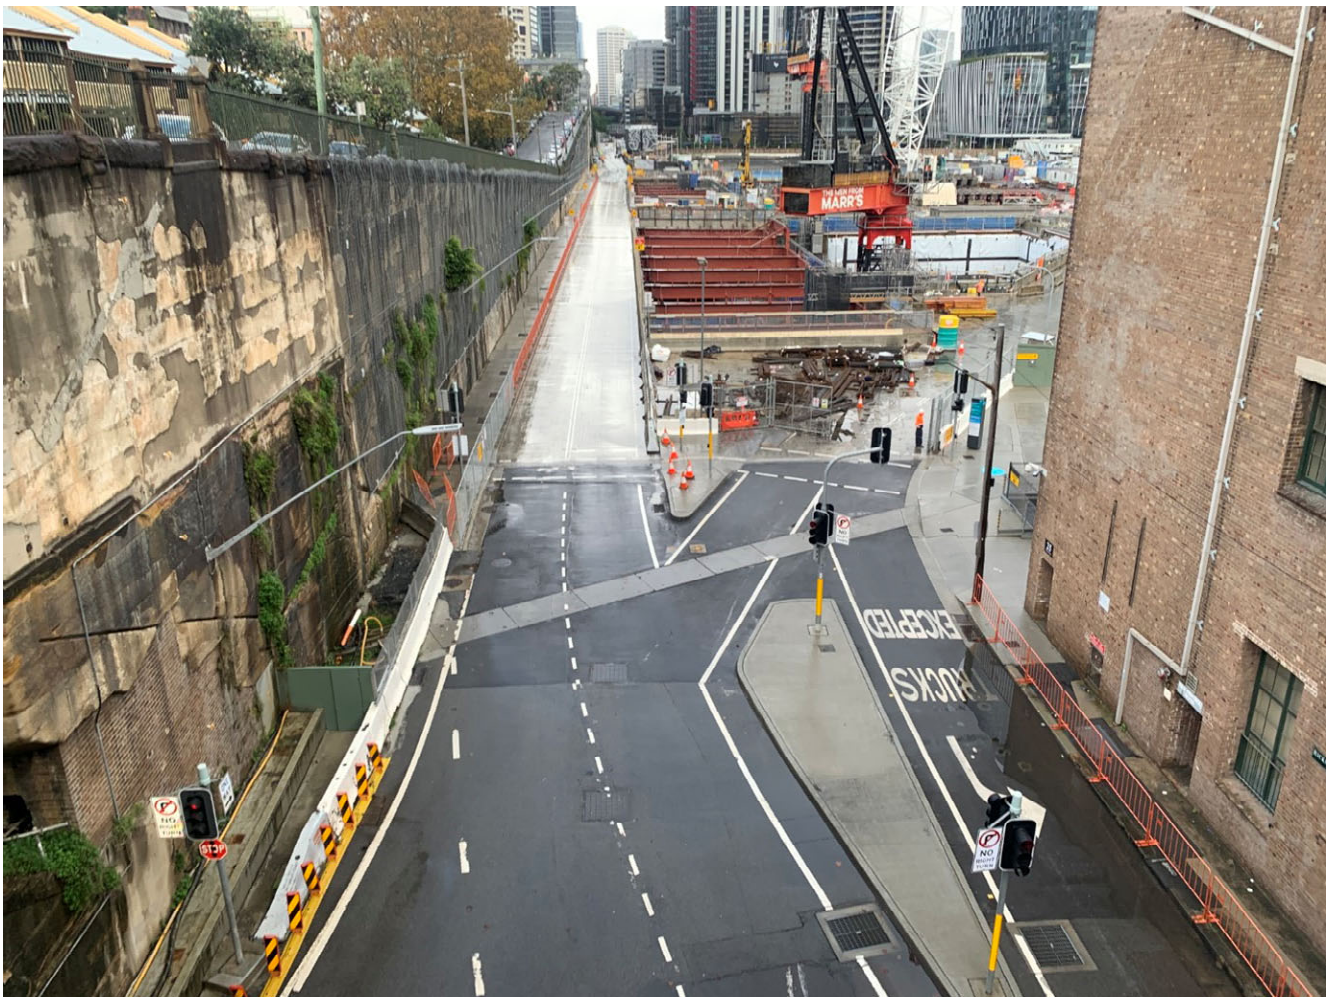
Stage 1 – Hickson Road Works – Current Arrangement Retained (Main Access)
